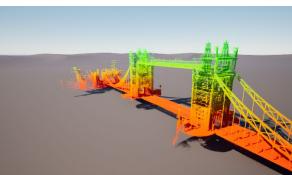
Example of a LIDAR scan of the Tower Bridge UK®
